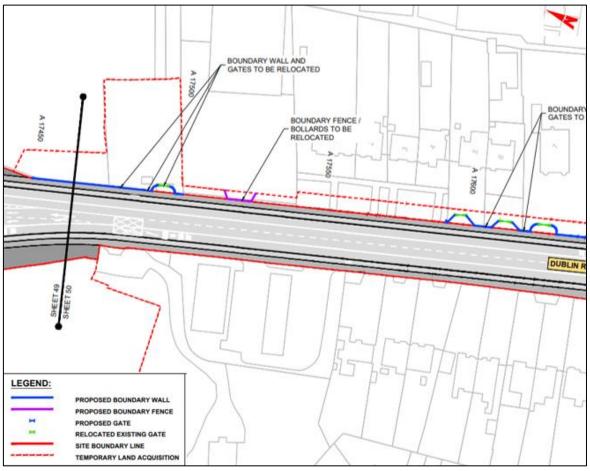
Extract from Fencing and Boundary Treatment Drawings at Windsor Motors Bray (Sheet 50)
